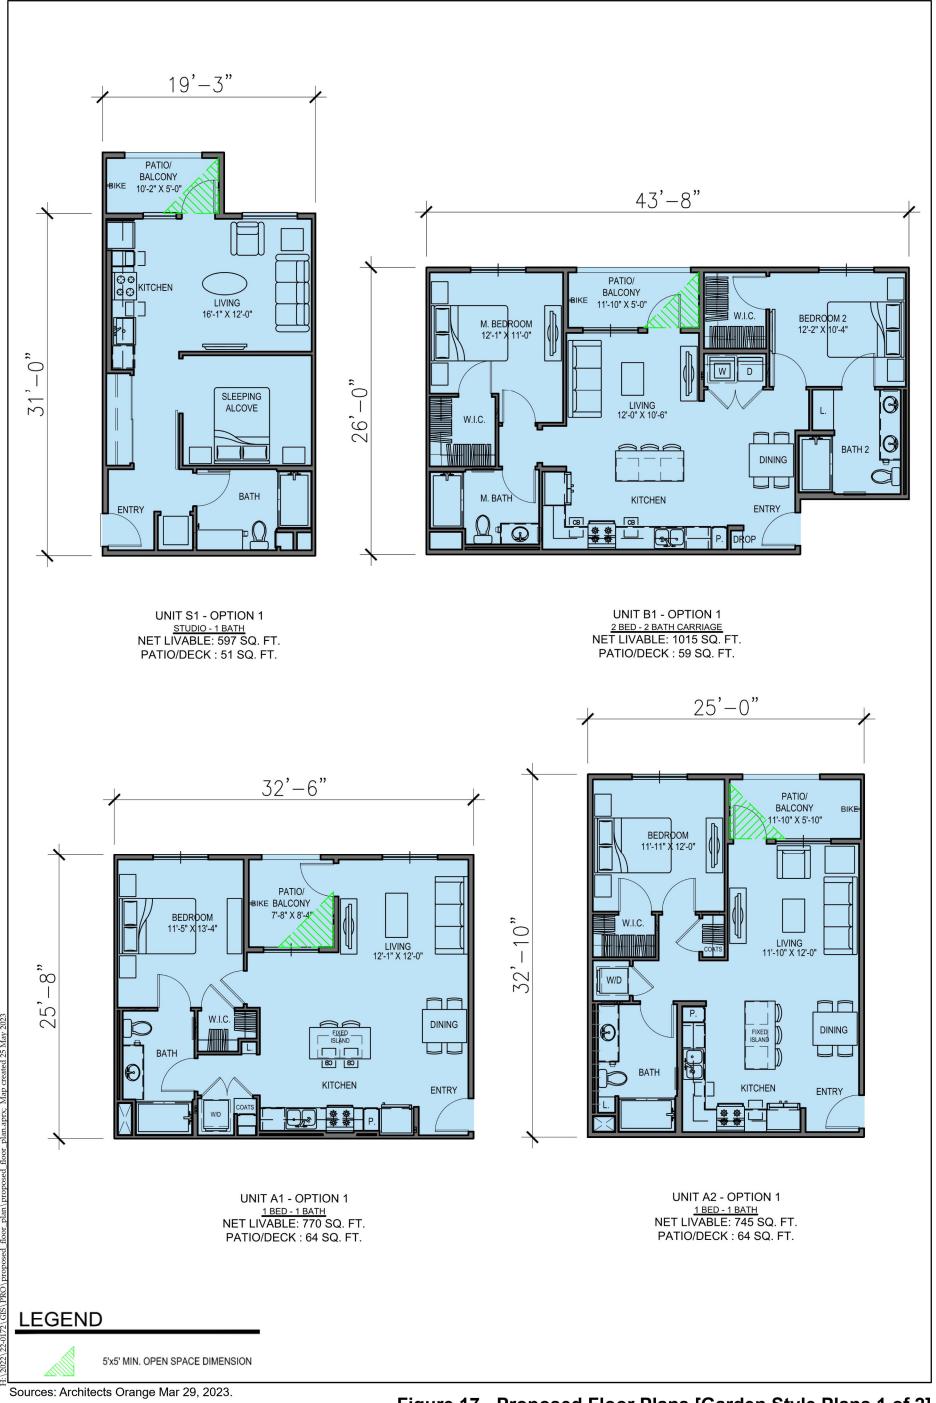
Proposed Floor Plans [Garden Style Plans 1 of 2]
